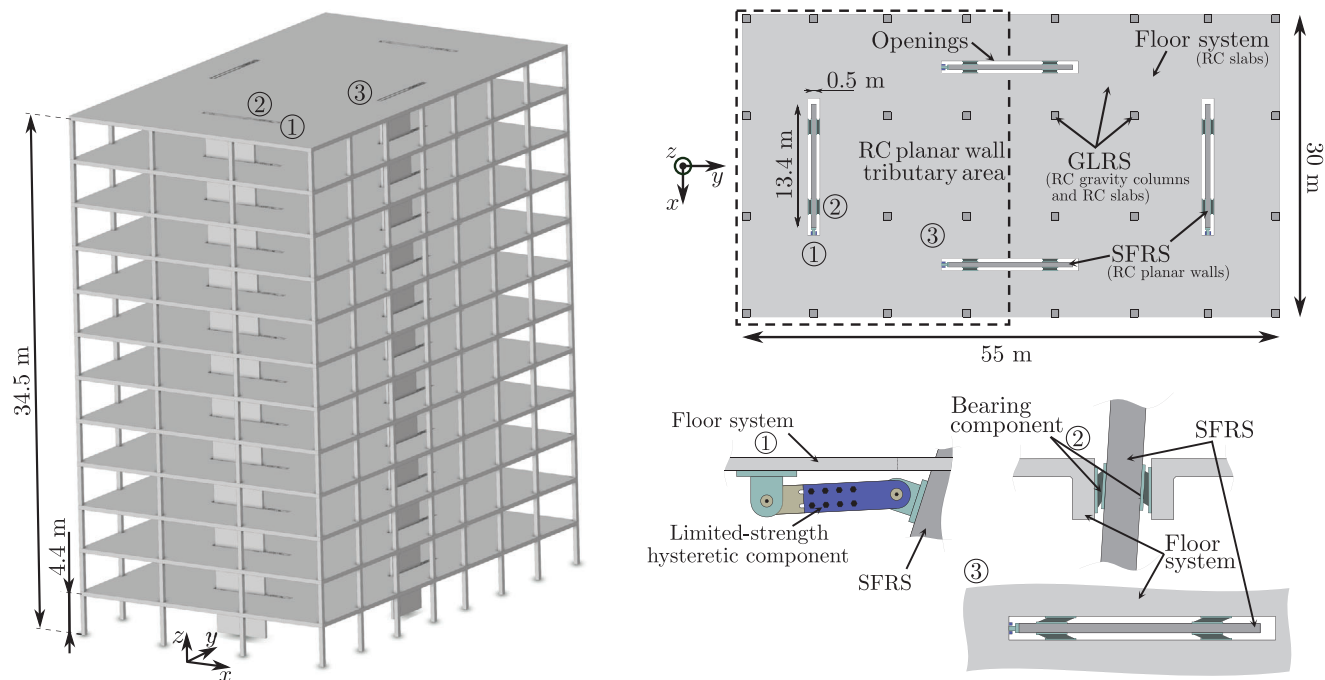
Schematic representation of the three-dimensional view, plan view, and connections between the GLRS and the SFRS of a building with force-limiting connections.
